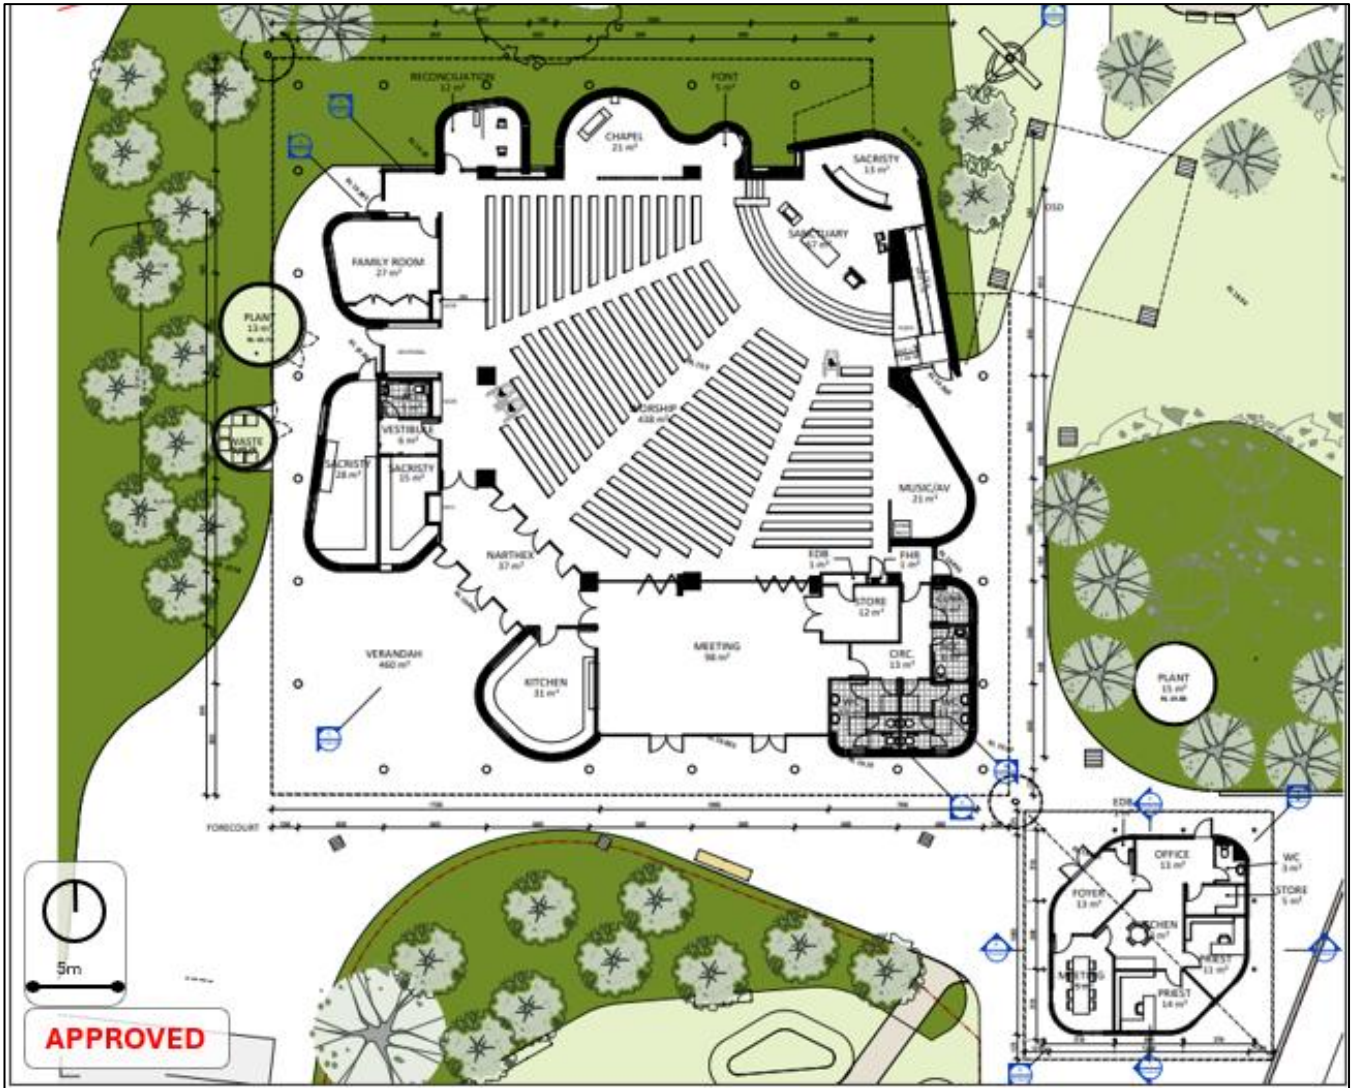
| Approved Sacred Heart Parish Church and admin building layout (Source: SSD-10383 Stamped plans)
